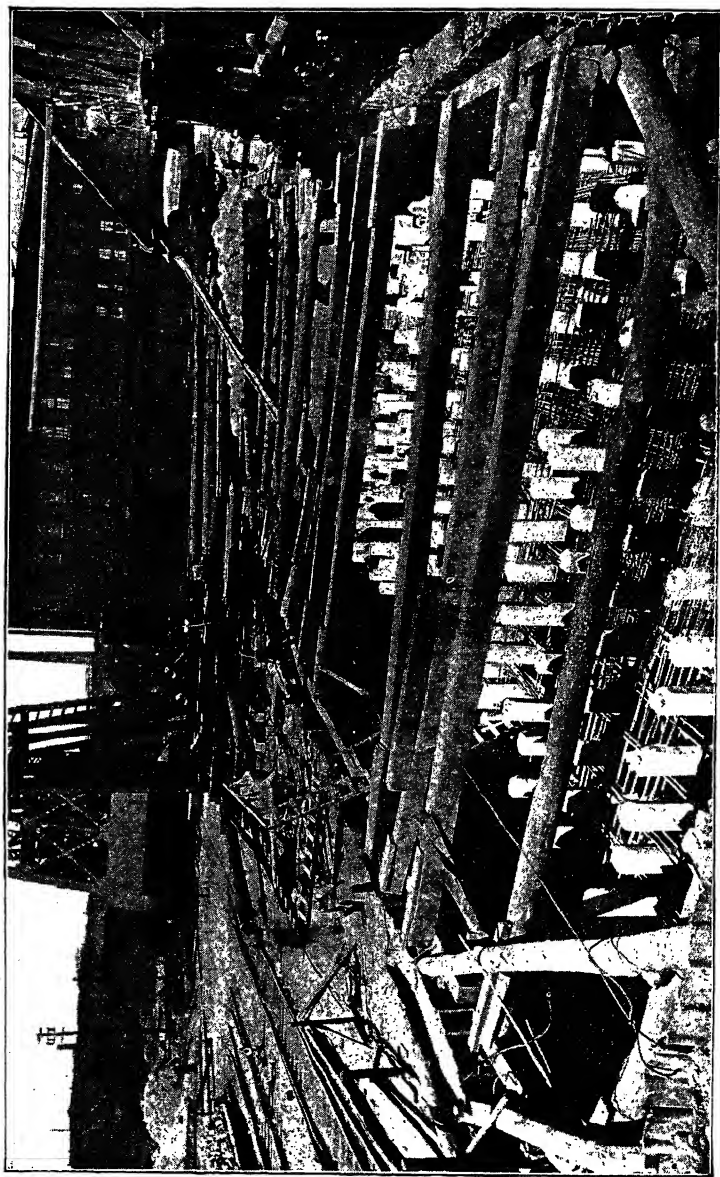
Concrete piles in foundation of Detroit-Superior bridge.
